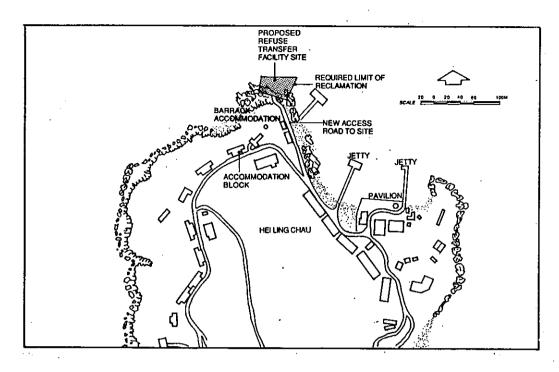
HEILING CHAU TRANSFER FACILITY LOCATION PLAN
